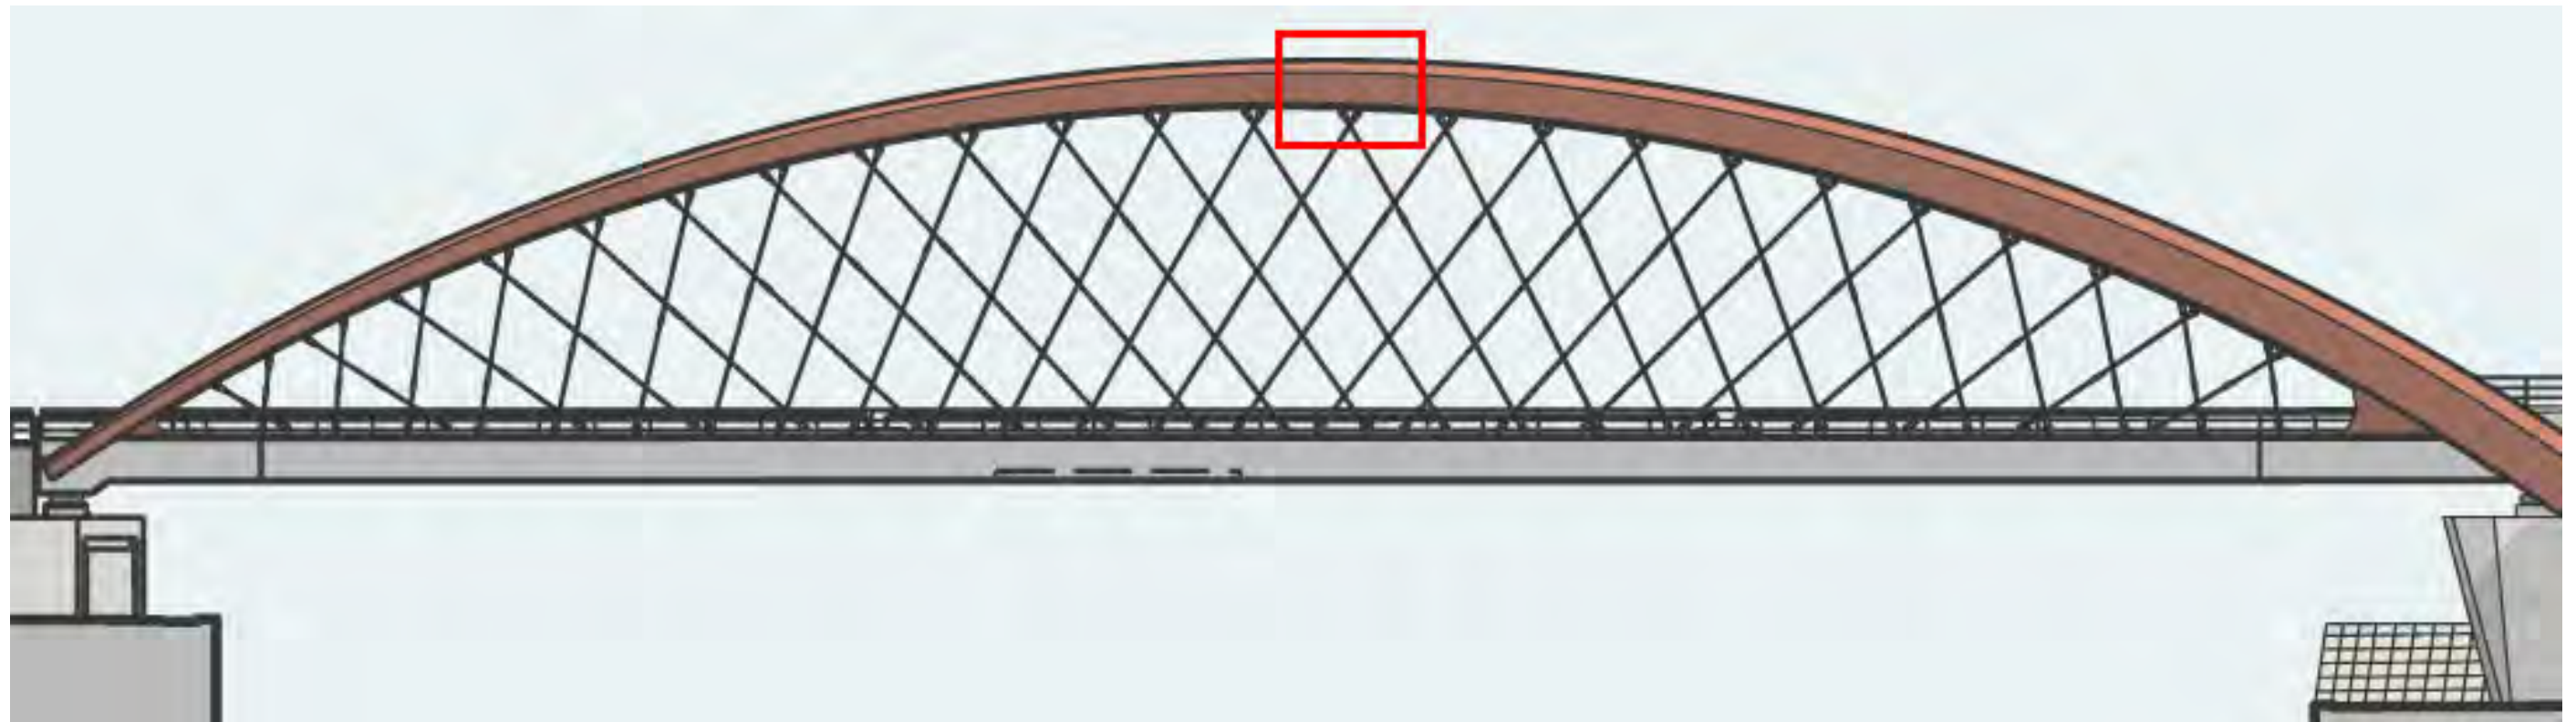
iv Visualisation of network arch crossing the River Irwell (relevant to stage E; section denoted in red has been prepared as a full size sample as shown in fig. xi - xvii)
